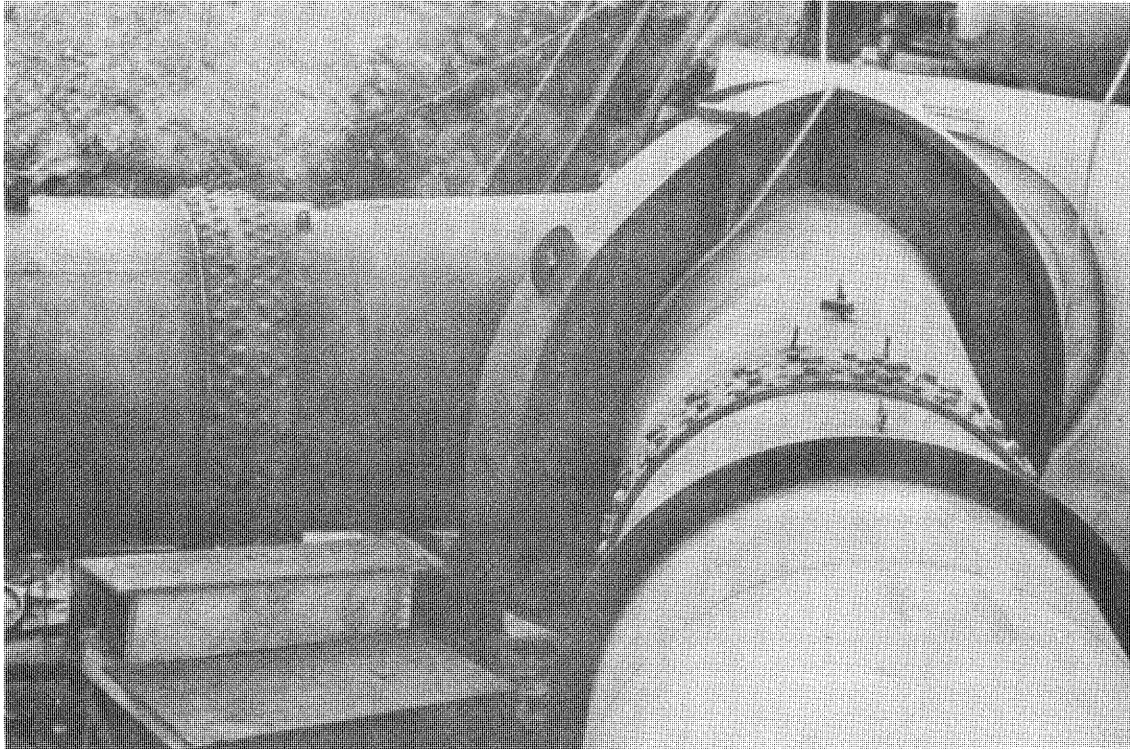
Penstock wye-branch after resizing buttstraps. Strap at left completely riveted and seal welded. Strap at right bolted up prior to welding. P783-908-1612, June 8, 1953.
